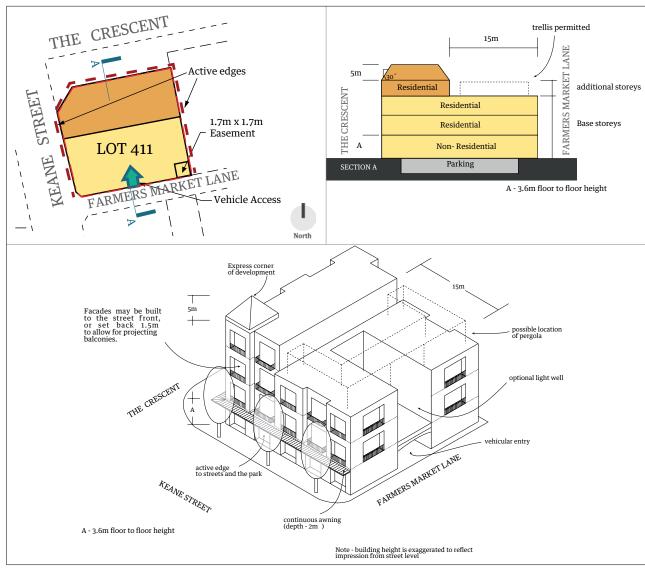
SITE G SITE SPECIFIC PLAN
